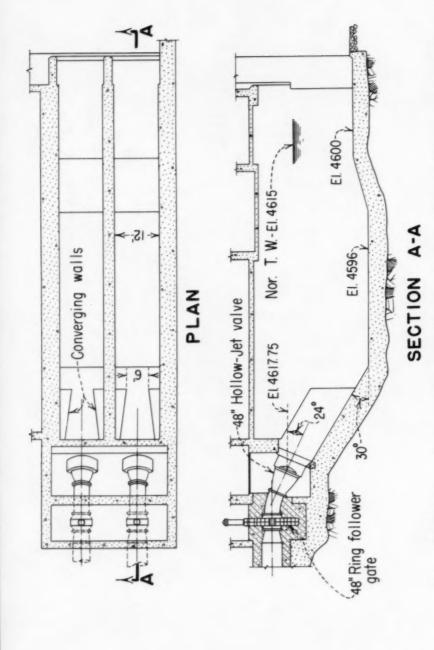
Stilling basin for outlet works located in Boysen powerhouse
